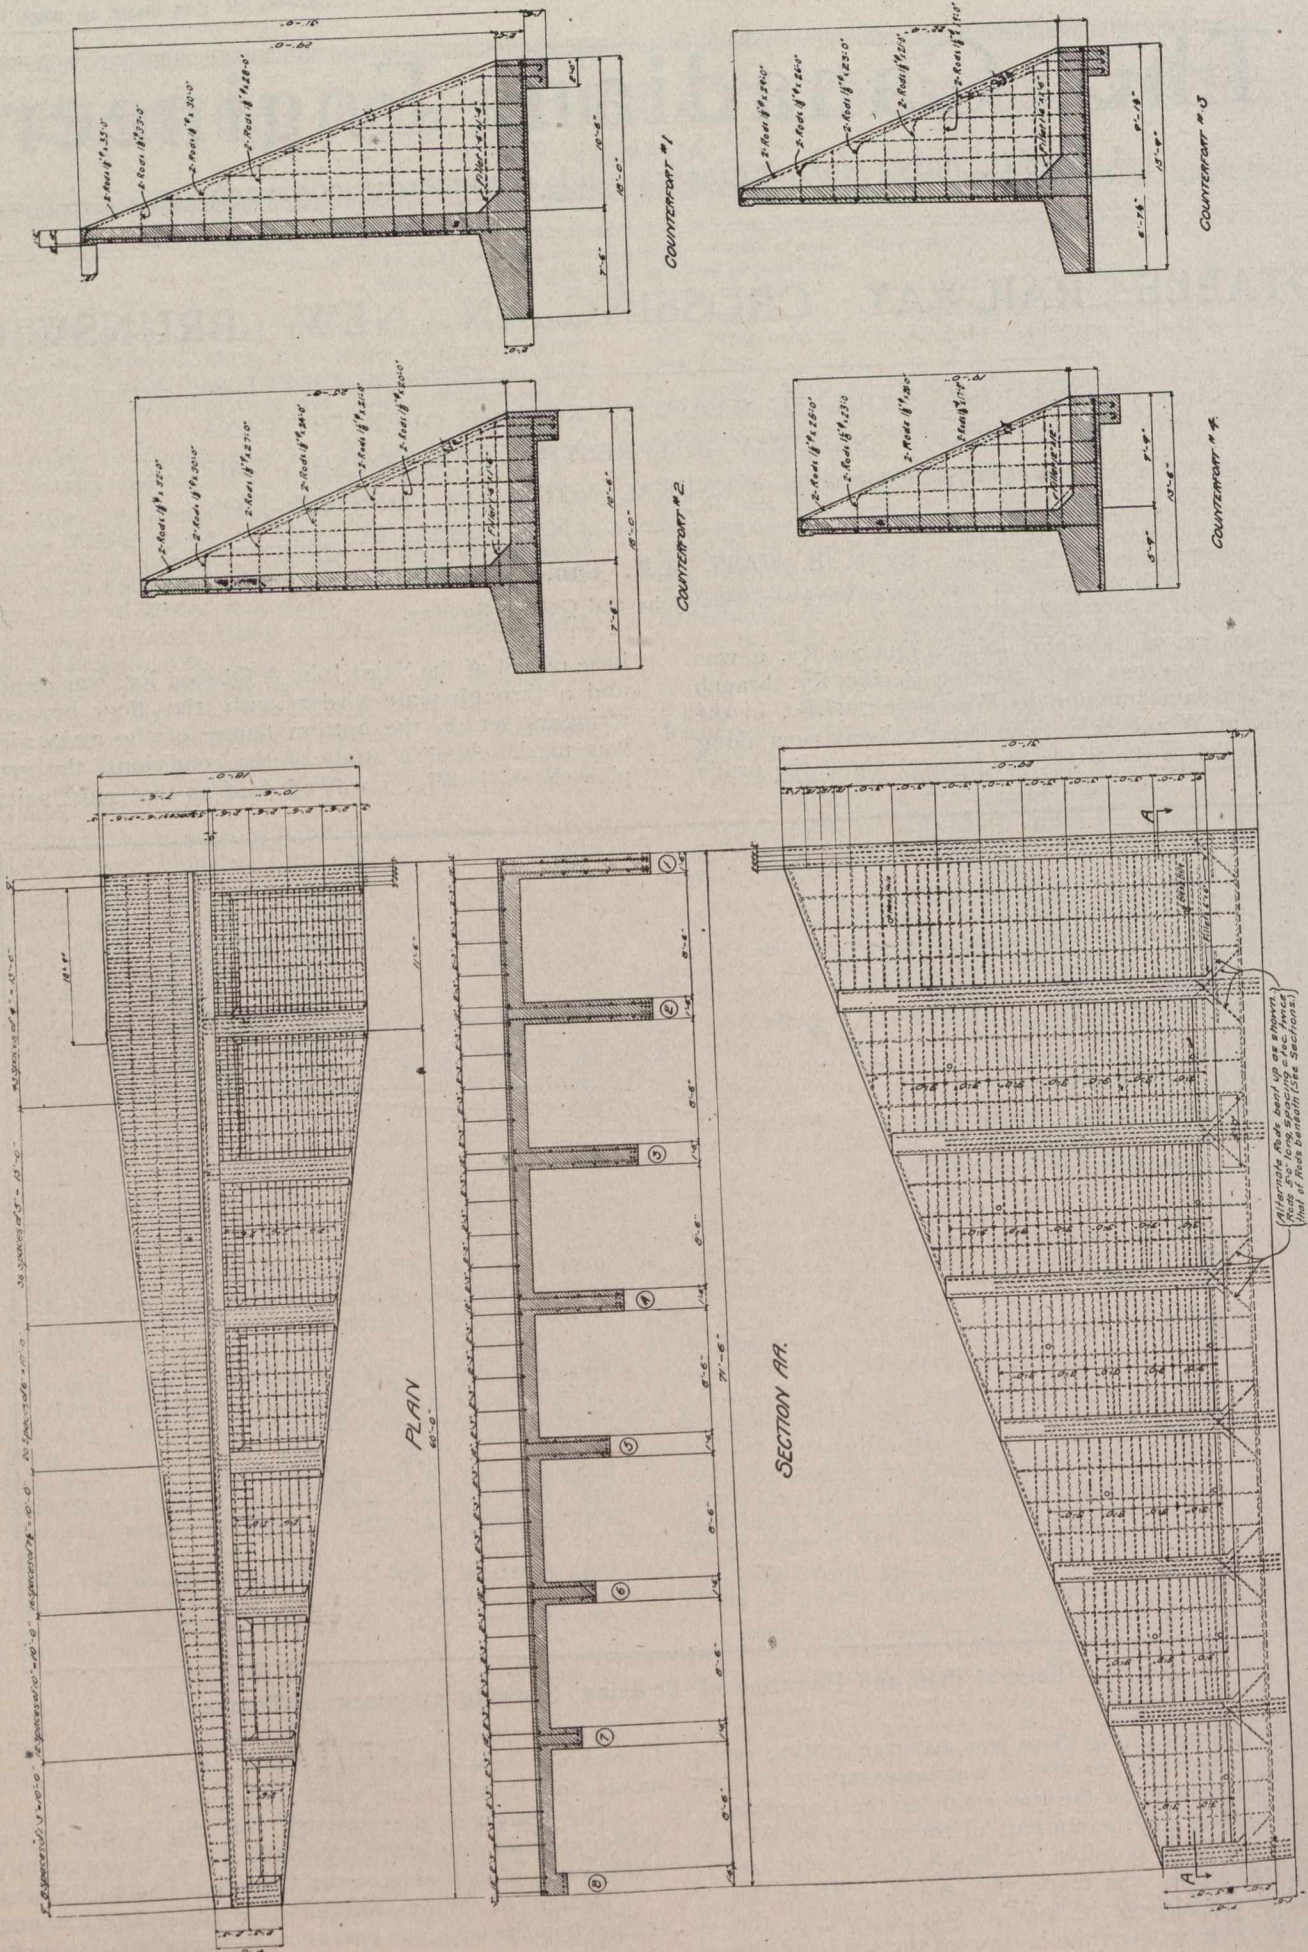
Details of the north wall, showing plan, elevation and sections of four of the eight counterforts.
